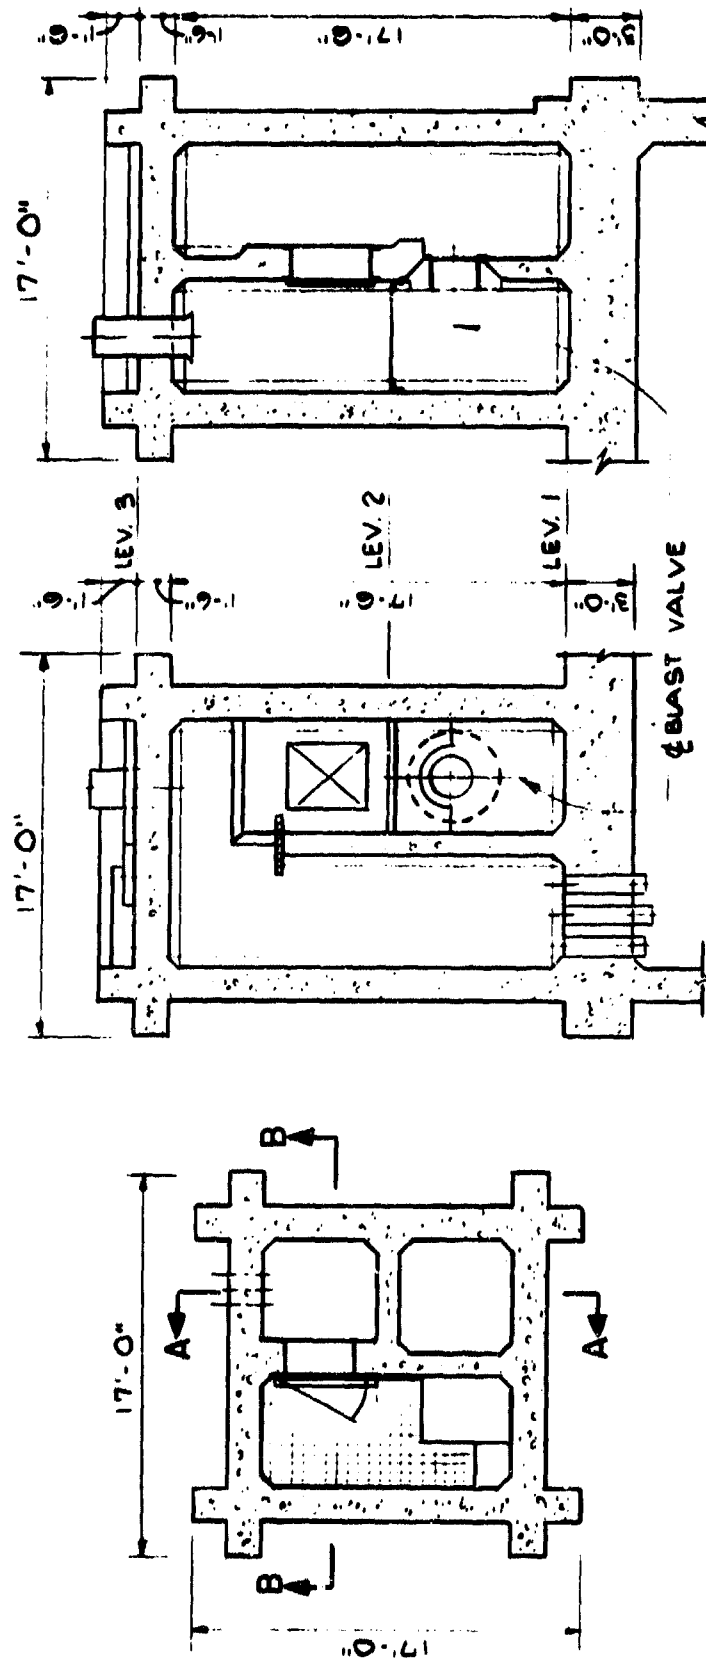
DAMAGED WEAPONS FACILITY (SECTION A)
